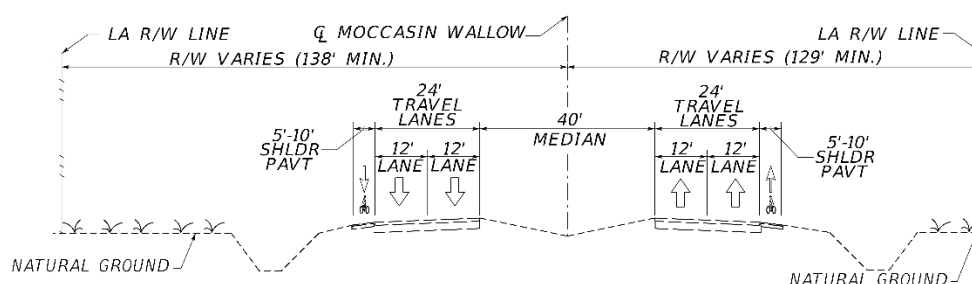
Existing Moccasin Wallow Road Typical Section
